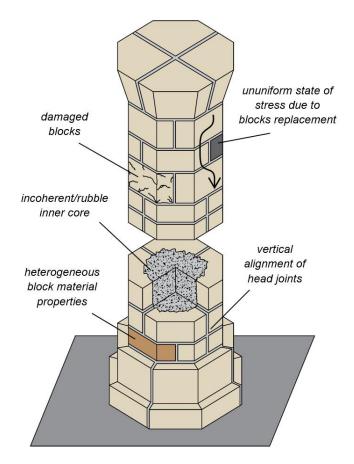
Typical defects and imperfections in stone masonry columns.
